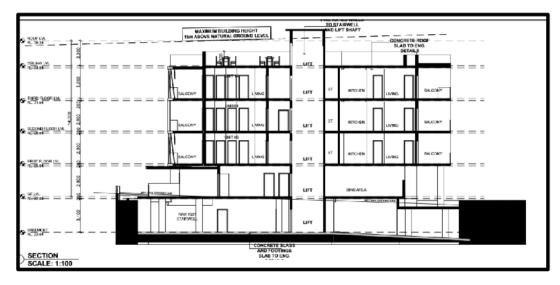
Extract of cross section (Source: Archi build International P/L, 2019).
